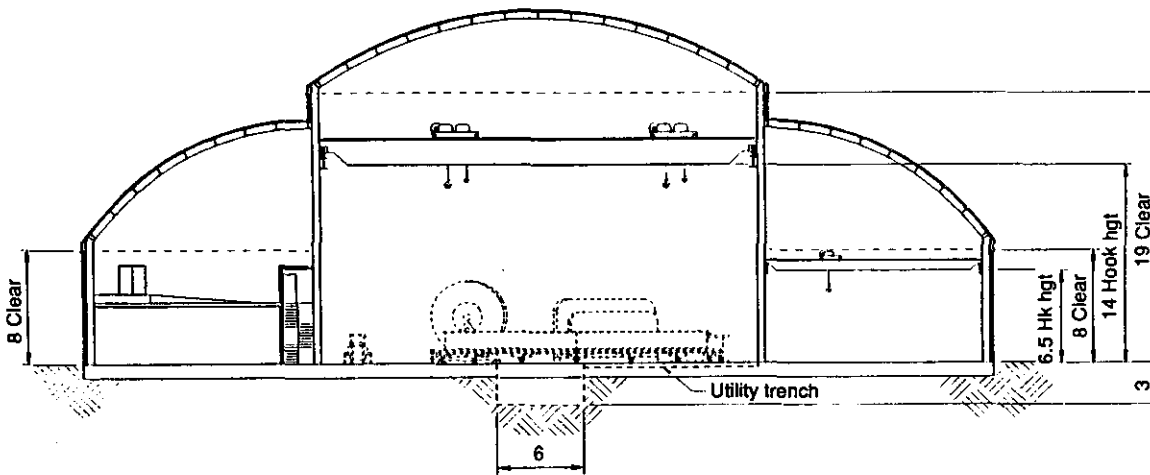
Proposed elevation view of the south assembly building (SAB).
